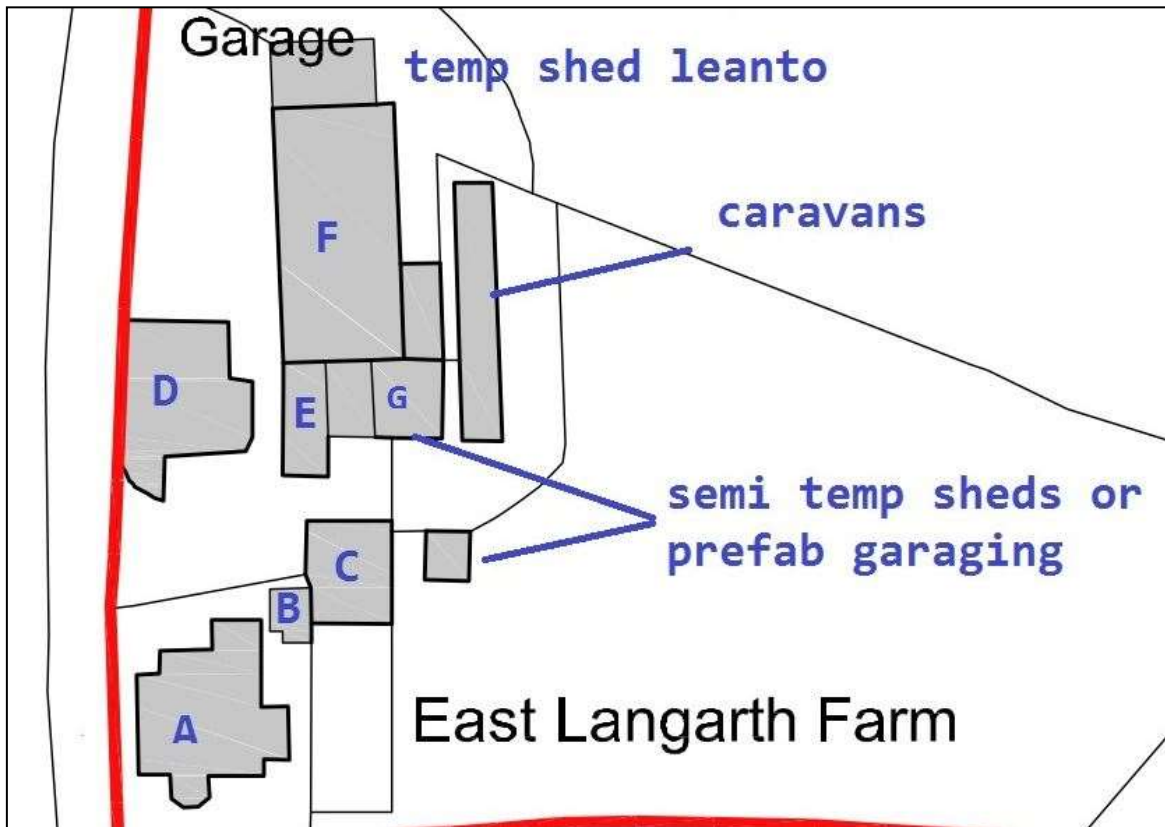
PLAN OF THE BUILDINGS AT EAST LANGARTH FARM; BASED ON PLANS SUPPLIED BY THE CLIENT.
